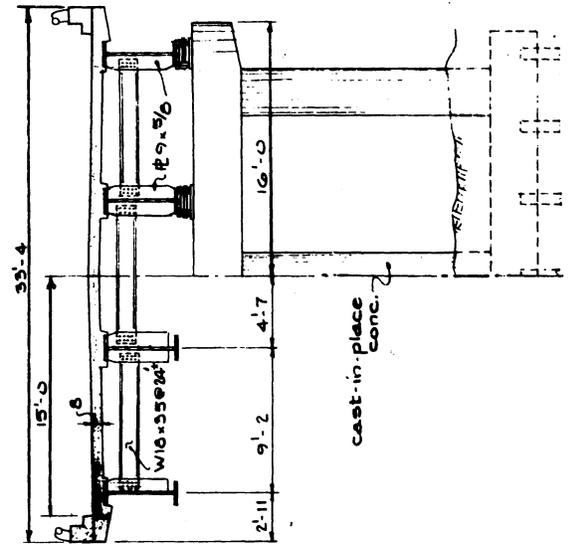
Final design for Plan C - CONTINUOUS SPAN.
